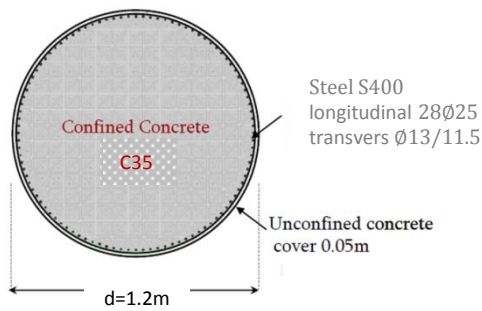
Geometric characteristics and reinforcement of pier's section
